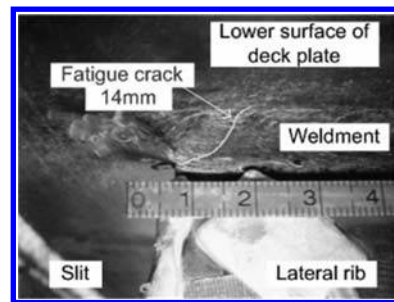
Fatigue crack at upper part of Rib 1 slit after 0.7 M cycles loading.
